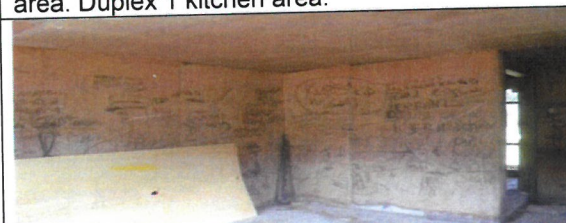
View showing entire internal wall lining to be remove and replace with new. Duplex 1
